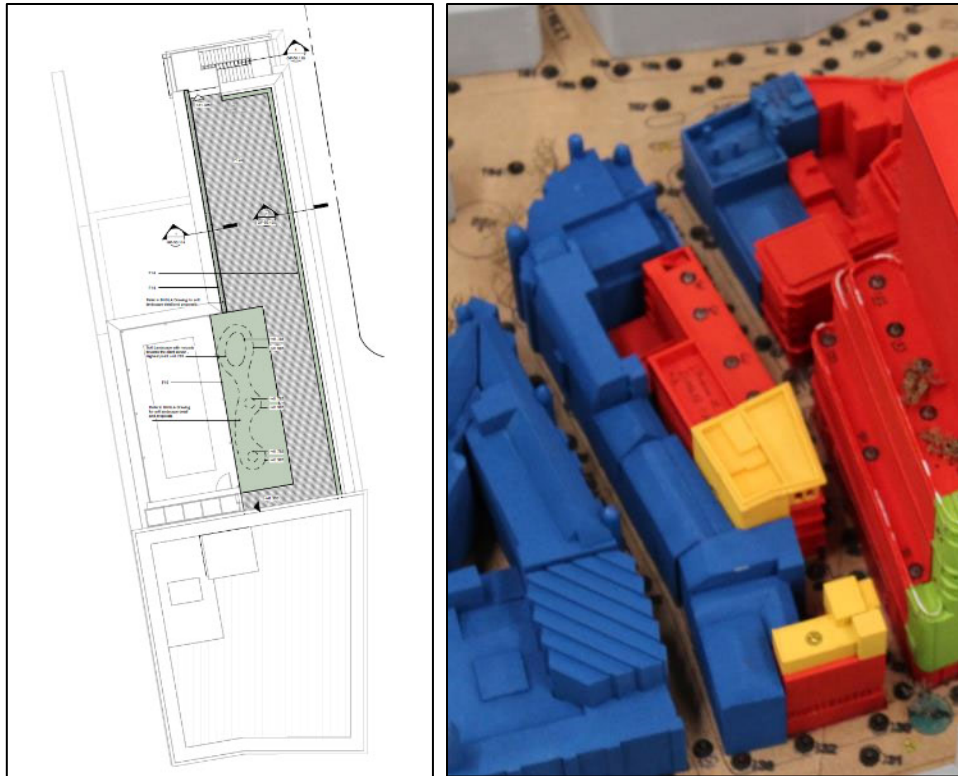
(Left) plan of proposed landscaping on the Vine Lane roof terrace; (right) view of the wind tunnel model
